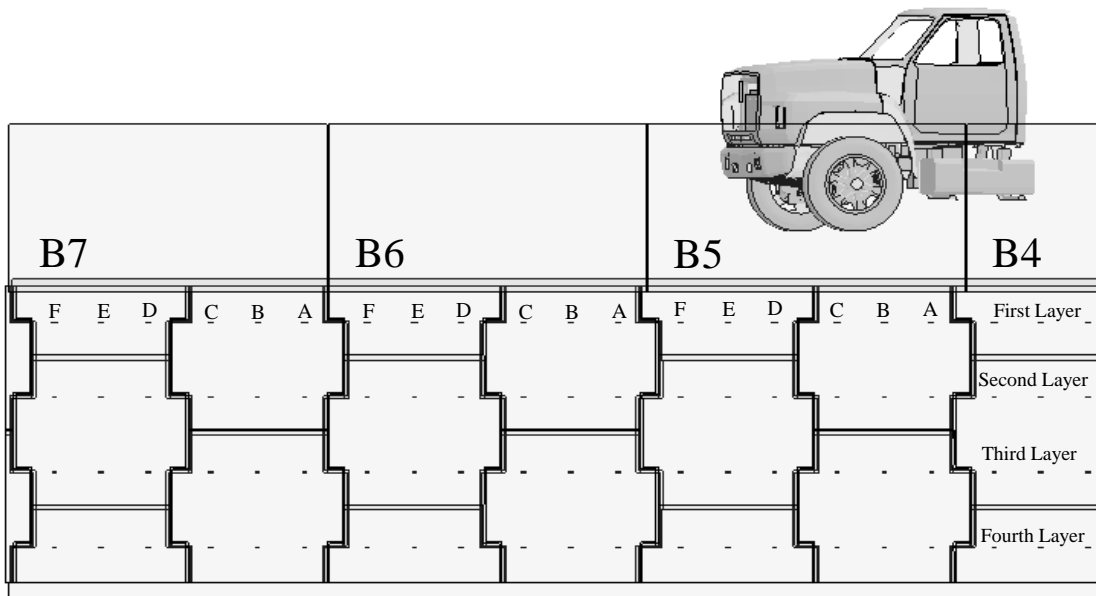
Elevation view of the MSE wall showing the strip distribution (TL-4 Impact)
